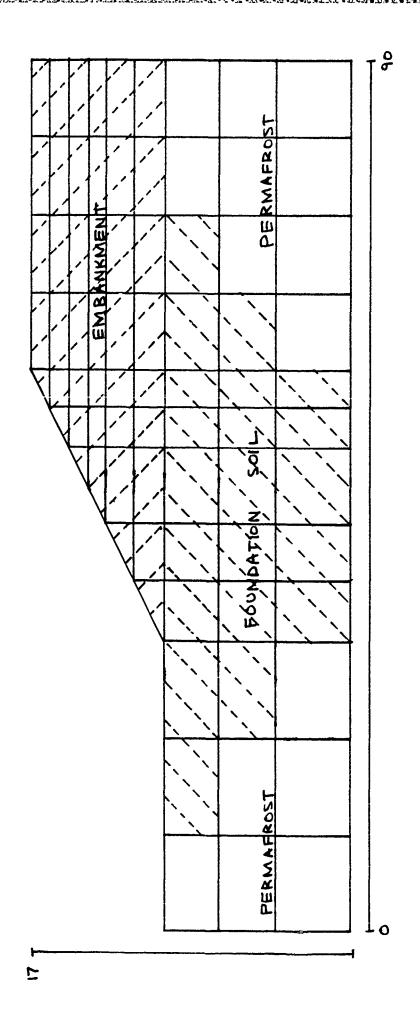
SSTIPN EMBANKMENT MODEL
